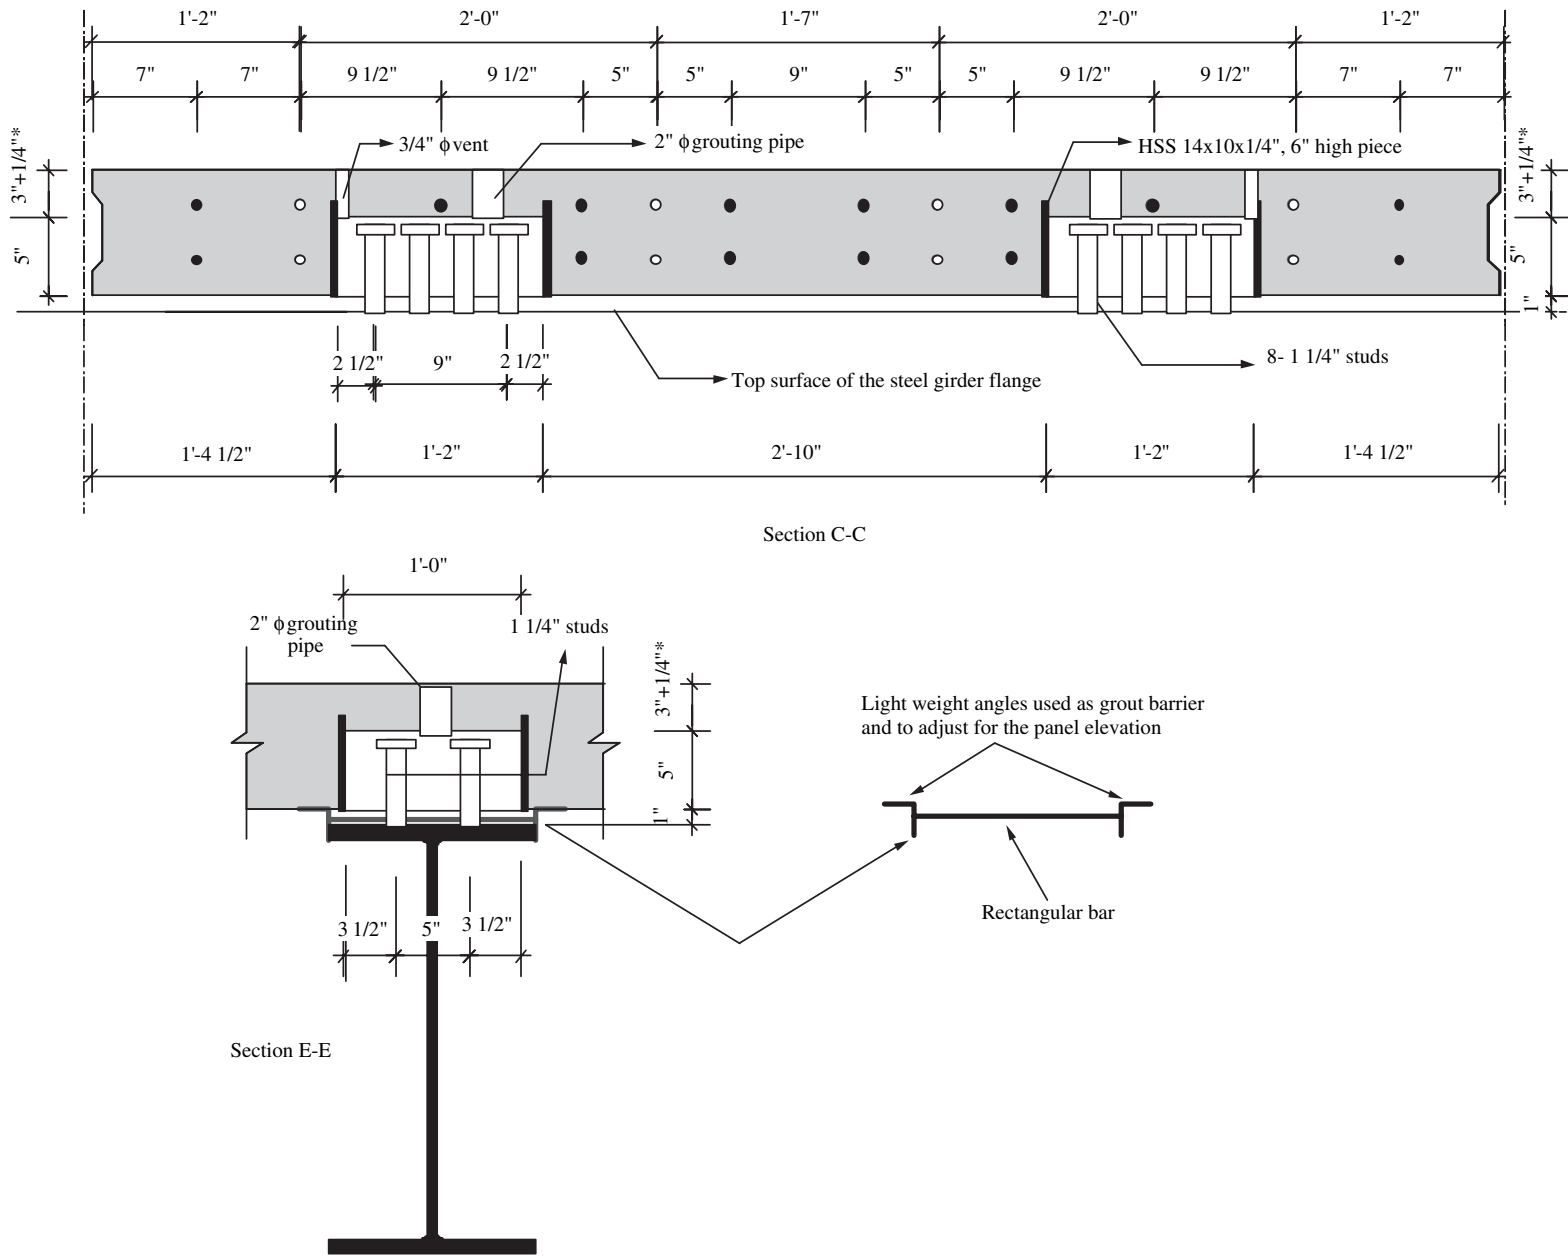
Sections C-C and E-E for steel girders (*1/4 in. is used as a sacrificial layer for texturing).
